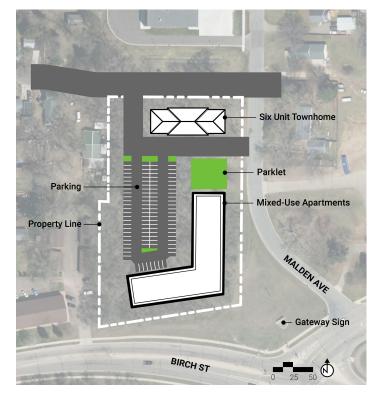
Figure C. Mixed-Use Schematic Site Plan (Ayres)
